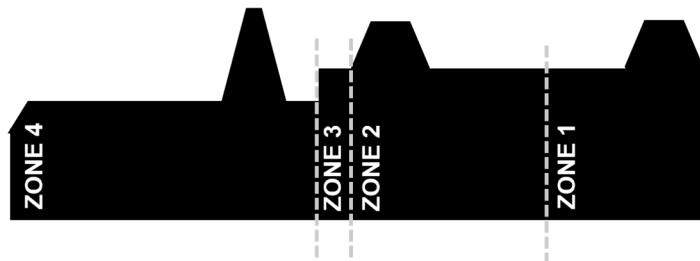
Block elevation diagram showing the thermal fabric ‘zones’ identified across Minto House from external observations of glazing systems, wall and roof constructions.
